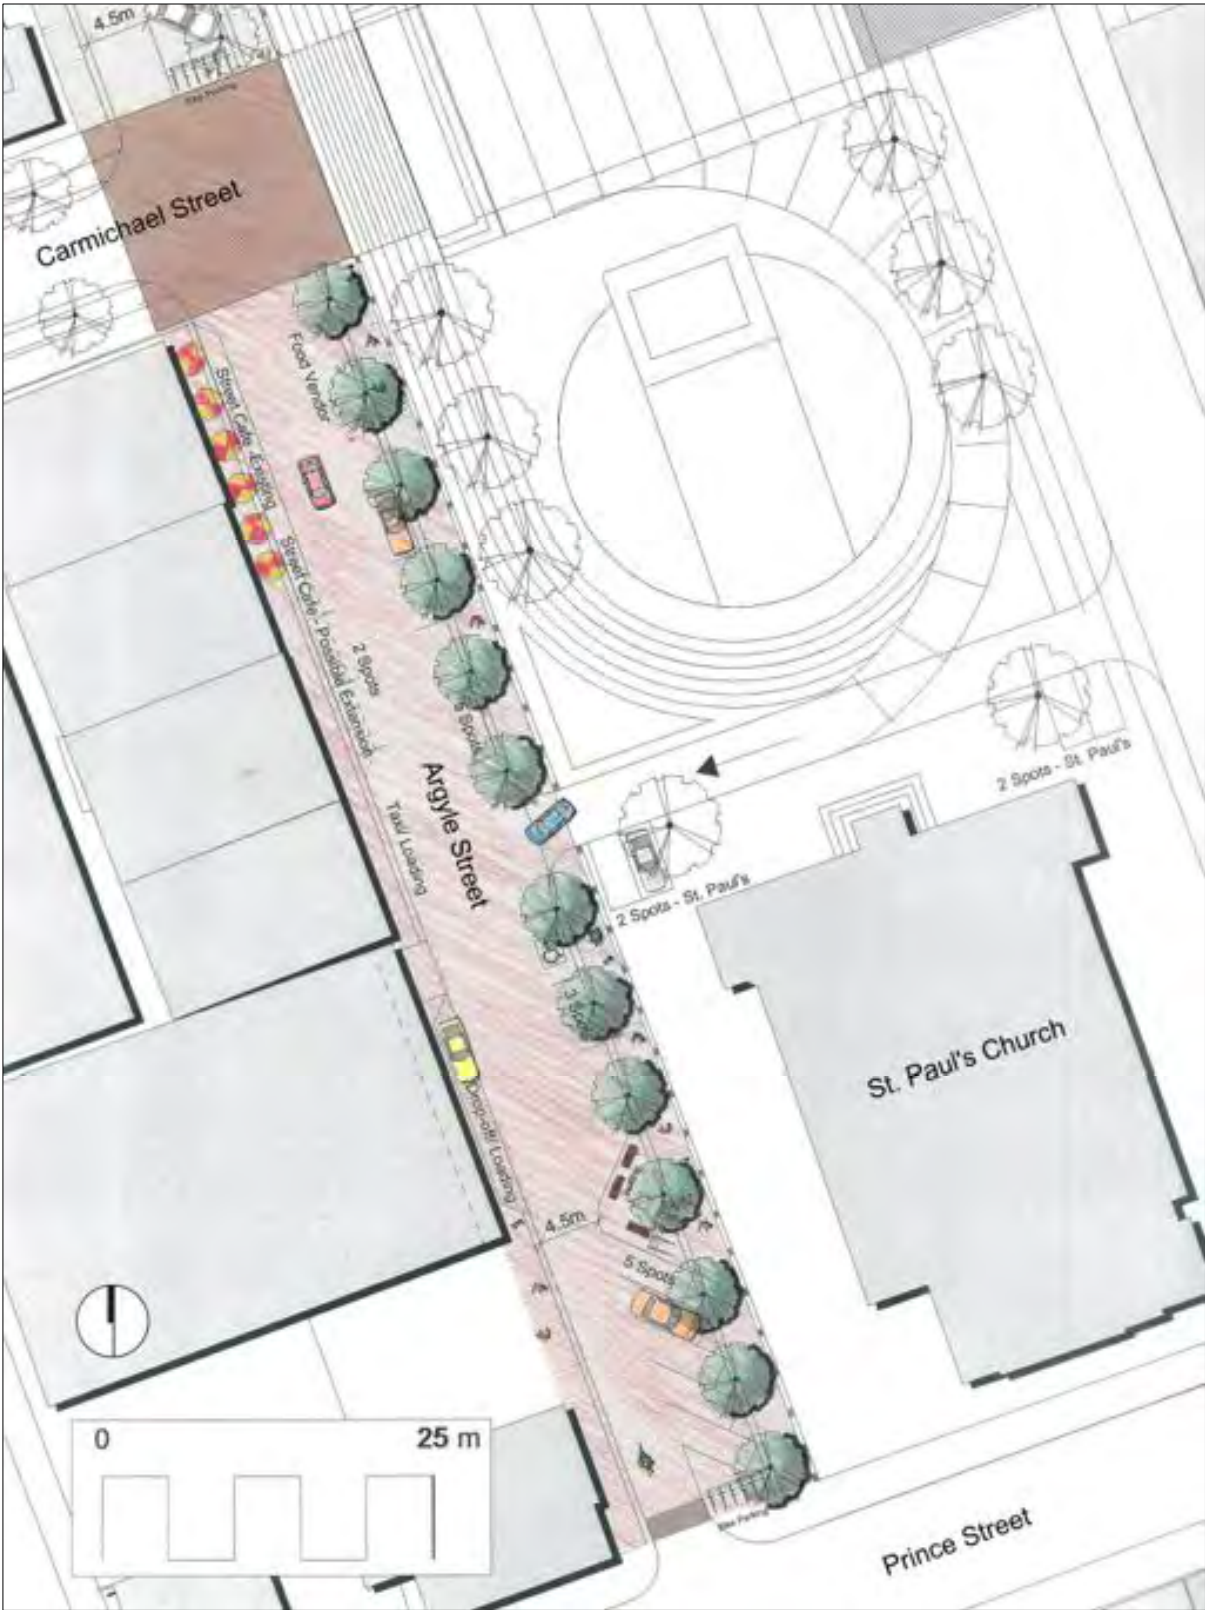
Argyle Street: "Living Street" layout and proposed parking configuration between Carmichael and Prince
